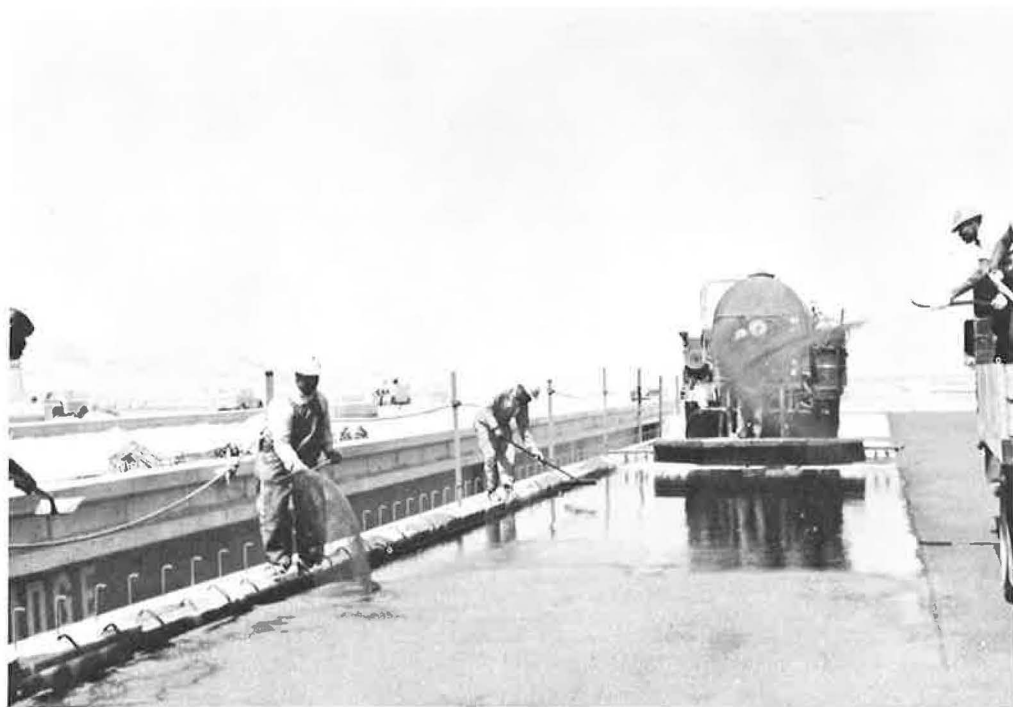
Spray bar application of coal tar epoxy and broadcasting of alumina grit over surface on Dublin Bridge.
